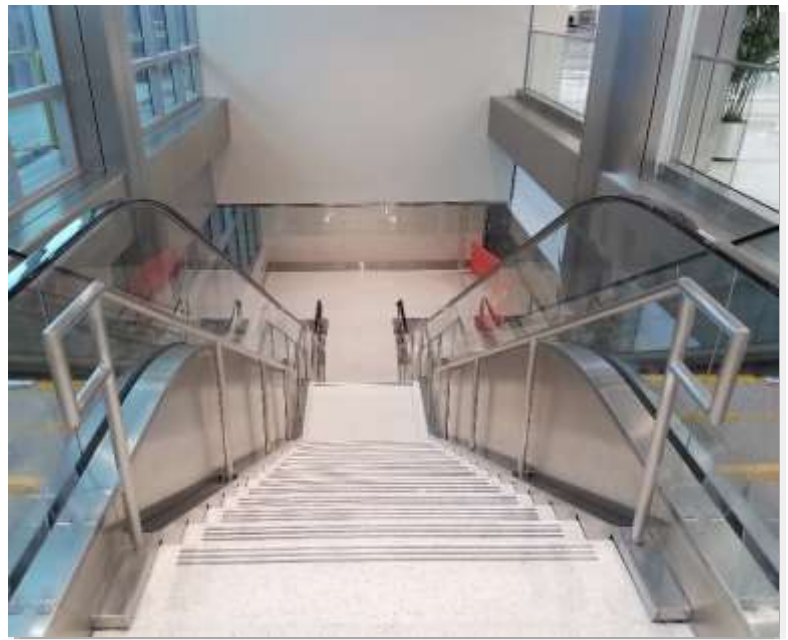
Example of Terrazzo Stairs at Terminal 2 Ticketing Level
